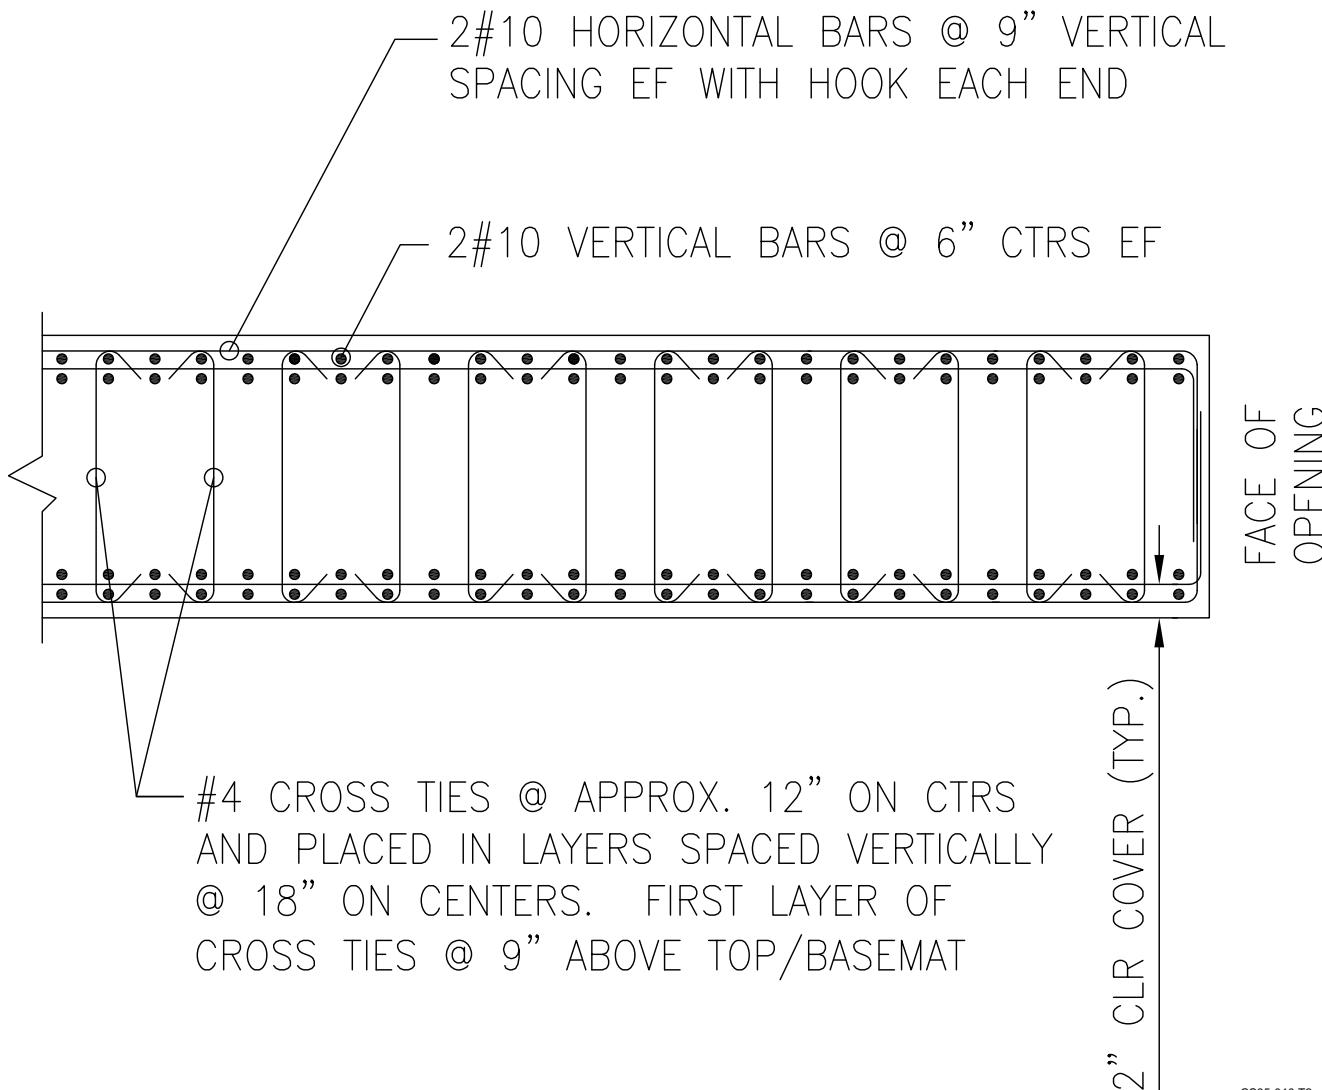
E.3.4-10—ESWB Wall D (Section B) – Reinforcement
